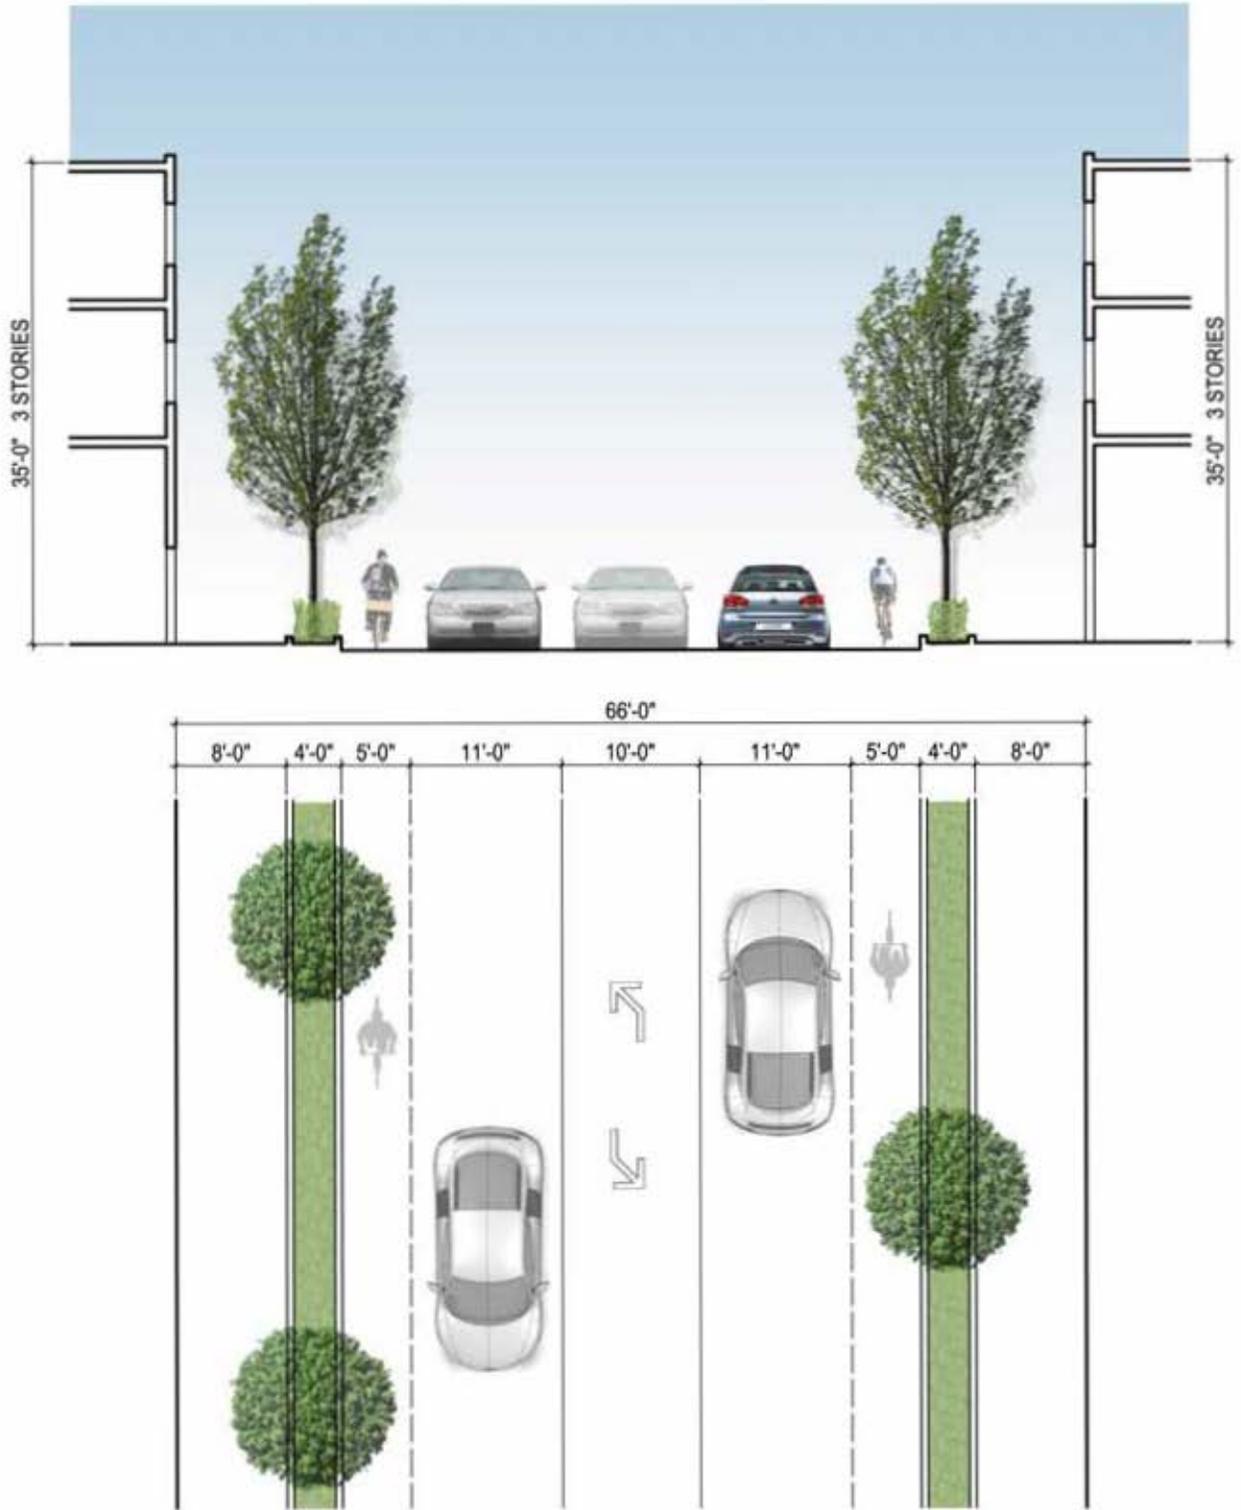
Street Plan and Section - LIRR to Hallock Ave with bicycle lane and planting strip
